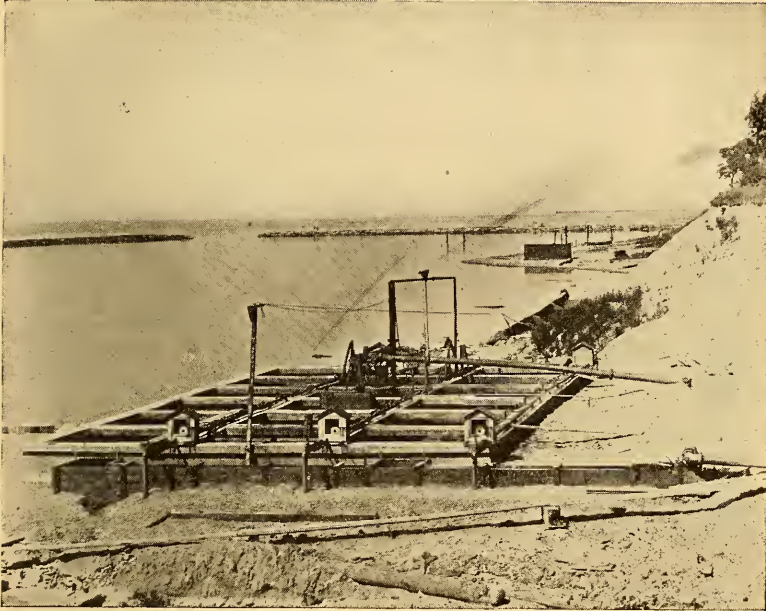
General View of Activated Sludge Plant at Cleveland.
